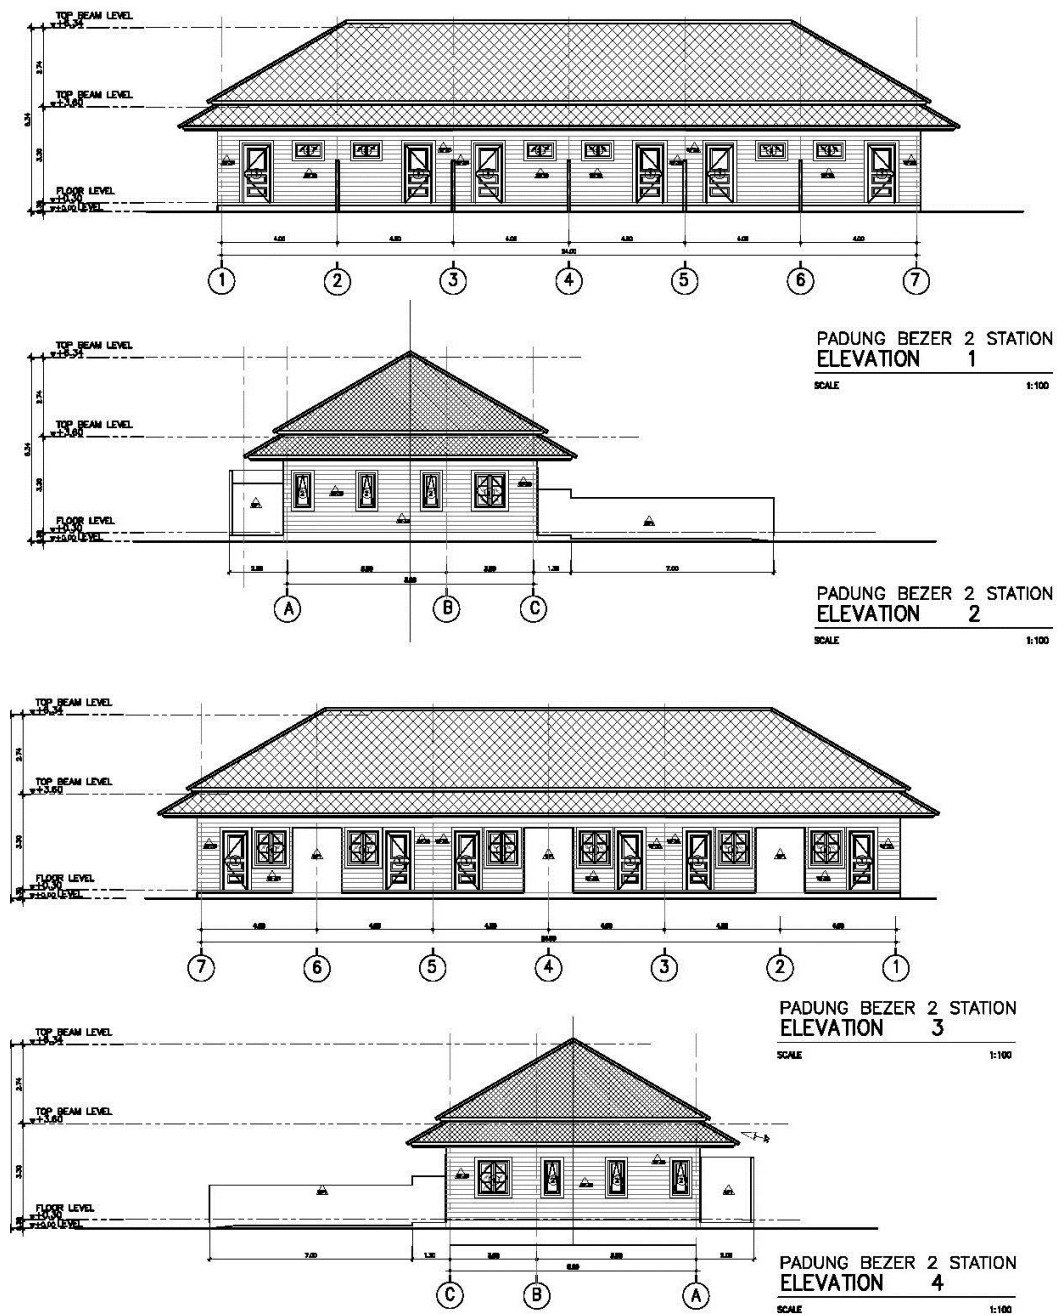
The Side View of the Staff Lodge RUNNING ROOM Plan, Padang Bezar 2 Station
